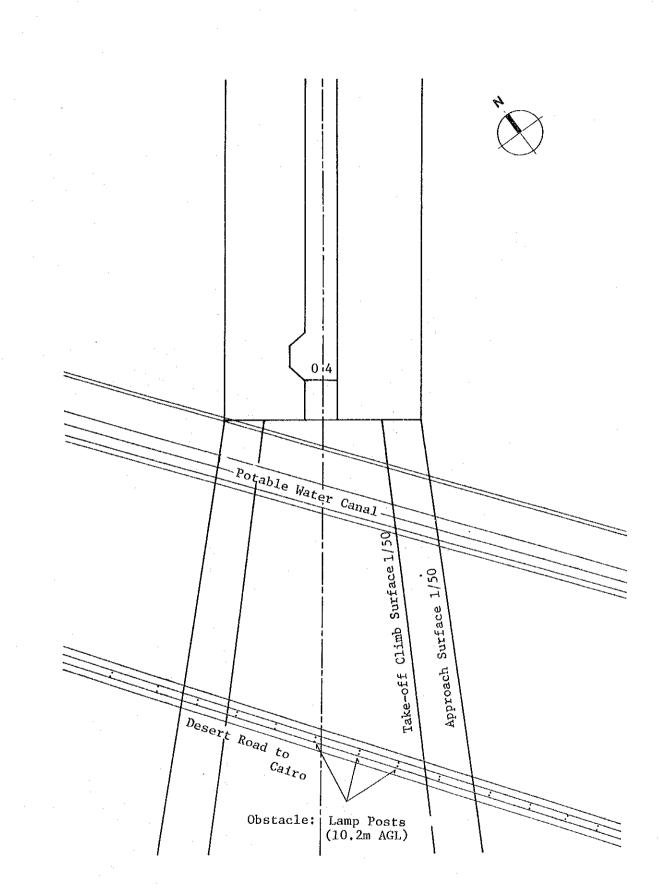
(1) Obstacles in Final Segment of Approach Area for Runway 04
